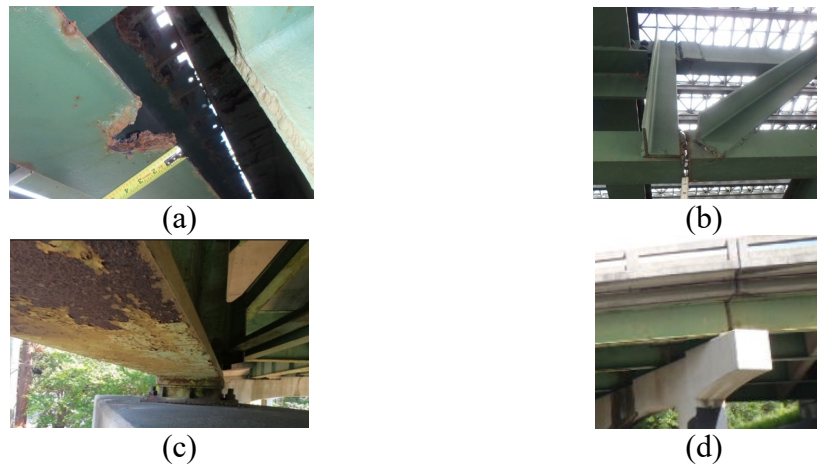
Superstructure elements of Bridge #1-4: (a) steel truss section loss (b) steel truss corrosion (c) loss of protective coating (d) steel girder ends (GDOT, 2022).
